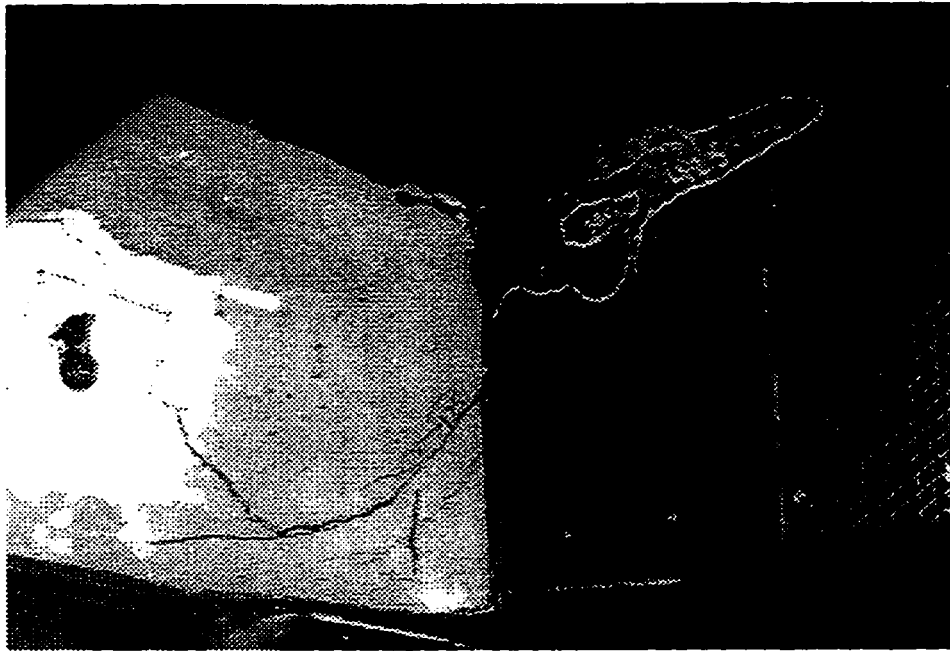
Photo of Test 4A Showing Shear Crack From Below Girder
